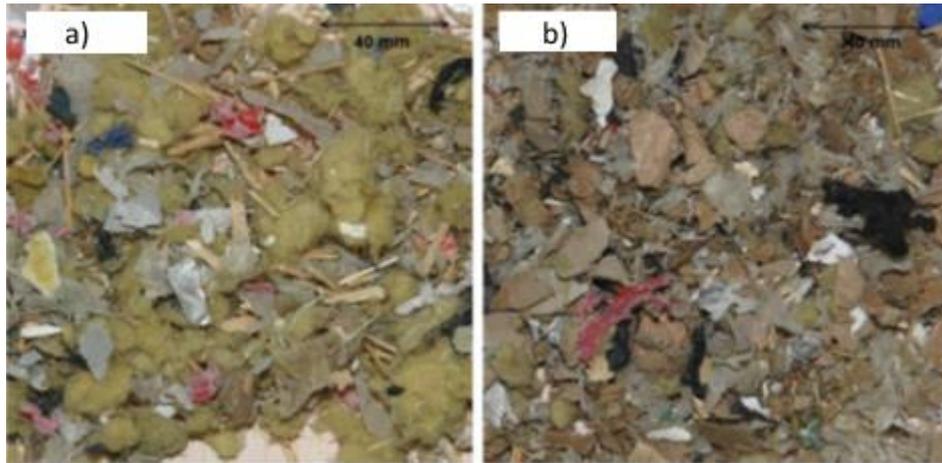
Presorted CDW material from separate construction sites; a) waste load from a renovation site, and b) waste load from a new building construction site.
